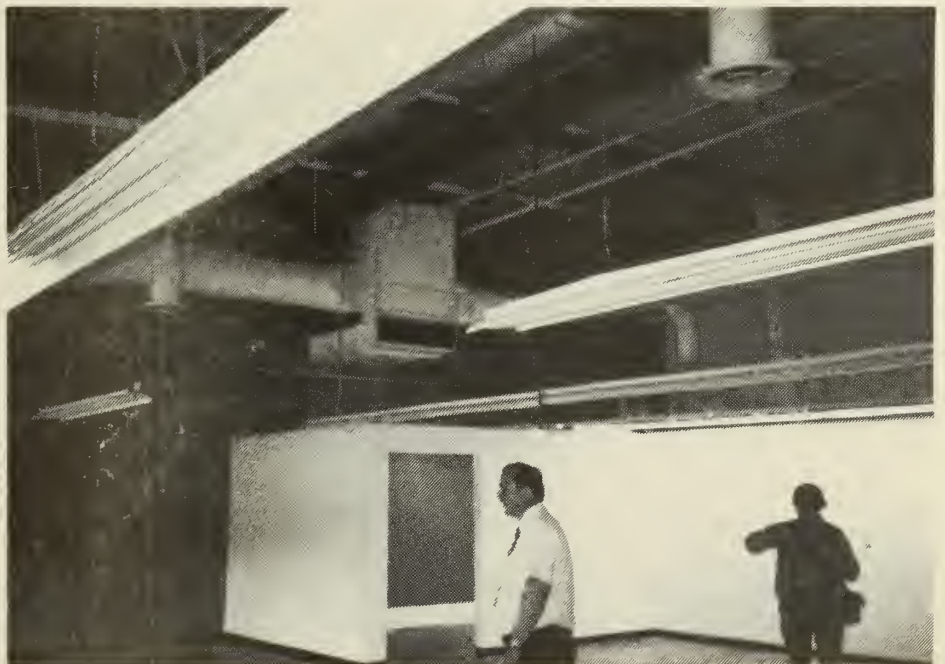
A few chain-suspended industrial light fixtures fell at Wiltron. There were also some circular ducting failures in this area.
